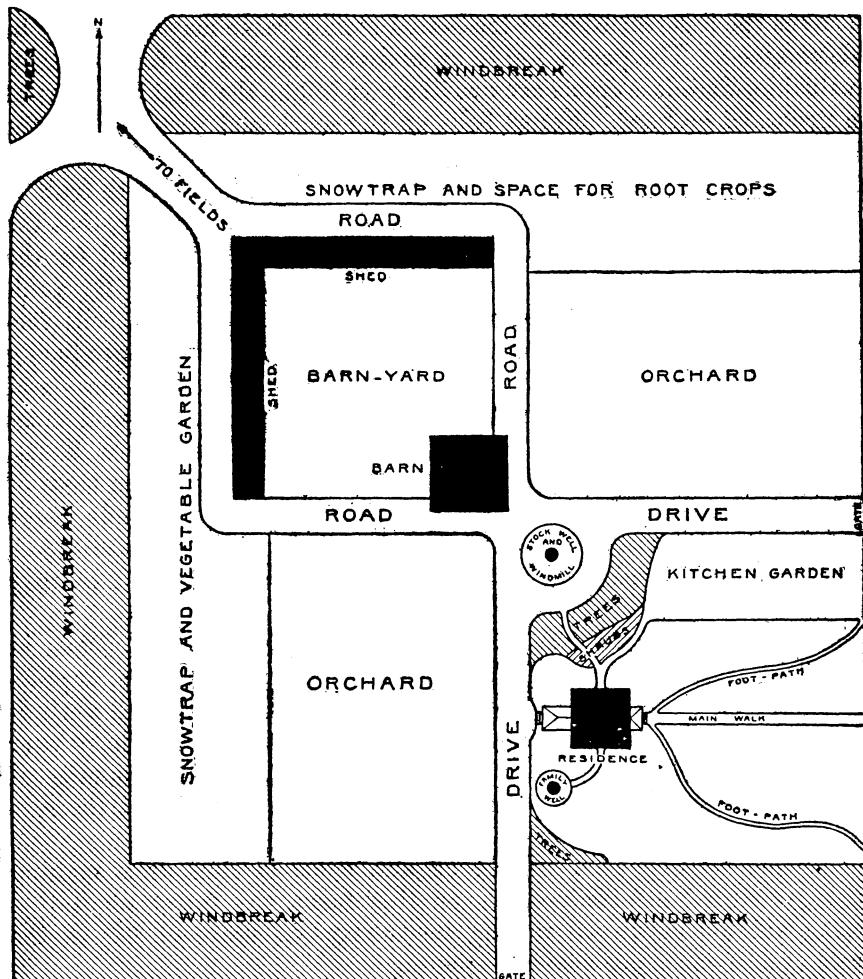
Plan of a farmstead, situated at the southeast corner of a prairie farm, arranged to afford windbreak protection.
